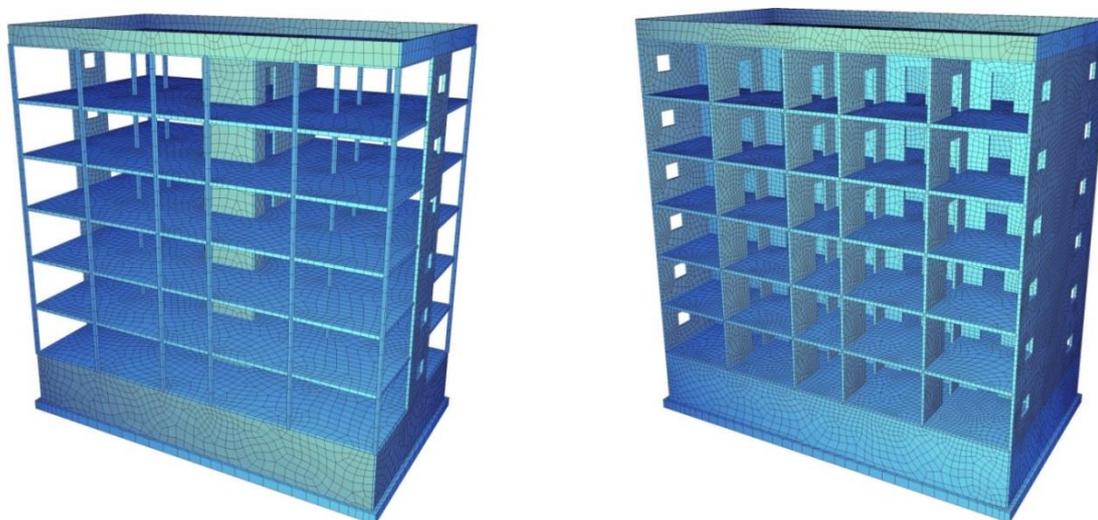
Examples for load-bearing structures in reinforced concrete, frame structure (left) and bulkhead structure (right)
